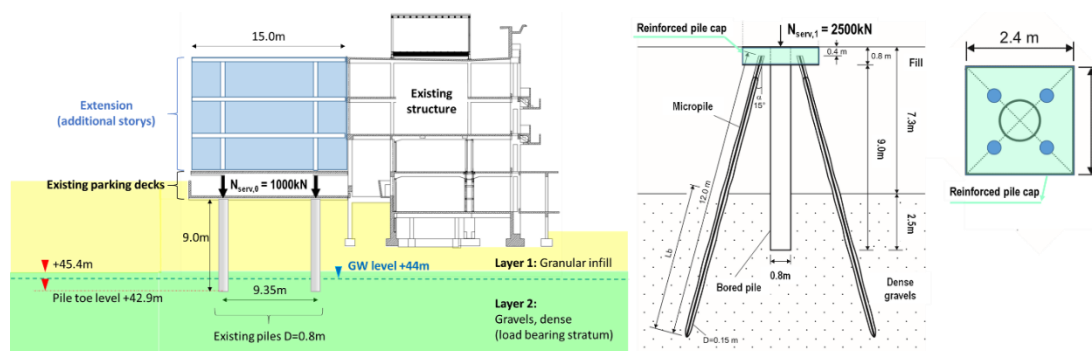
Intervention project and proposed reinforcement (after Lopez et al., 2018)
